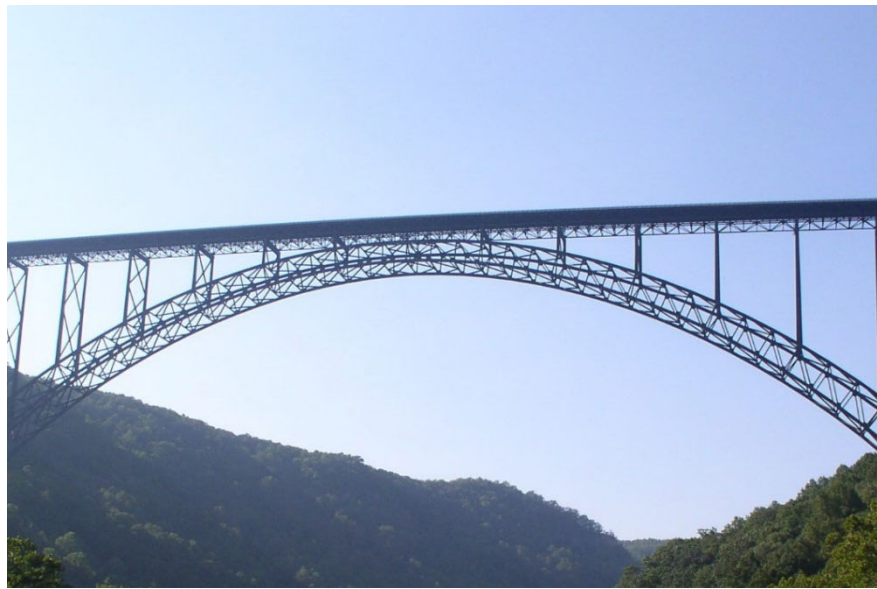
Deck Arch Bridge with Stiffening Truss in Main Arch
